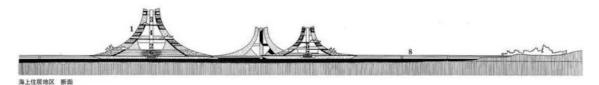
Section of Tokyo Bay Plan by Kenzo Tange in 1960. Source: https://archeyes.com/plantokyo-1960-kenzo-tange/
